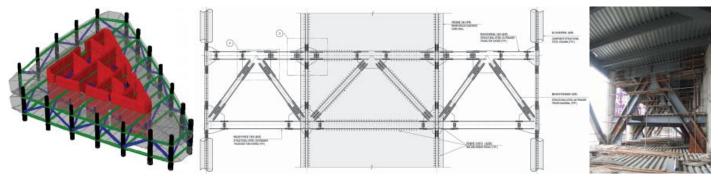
Left: Outrigger and Belt Truss Configuration; Middle: Typical Outrigger Truss Elevation; Right: Photograph of Outrigger Truss Construction
